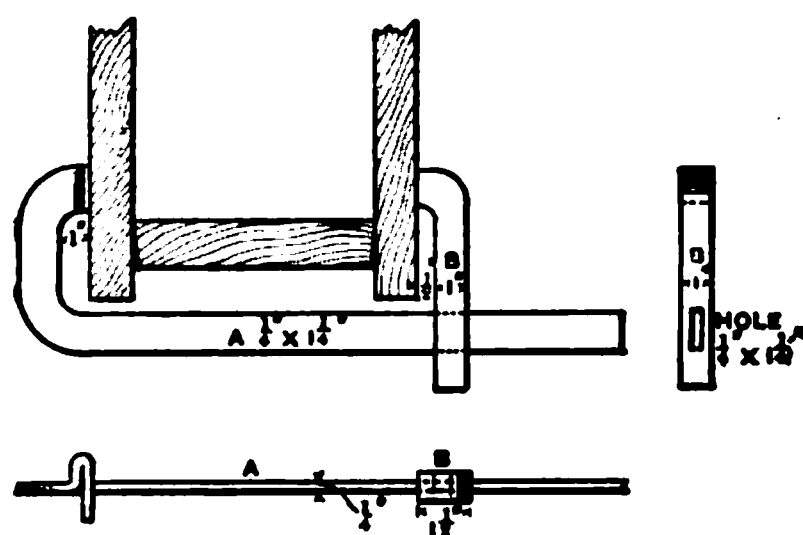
Clamp for Beam or Small Column Form. (See p. 459.)
